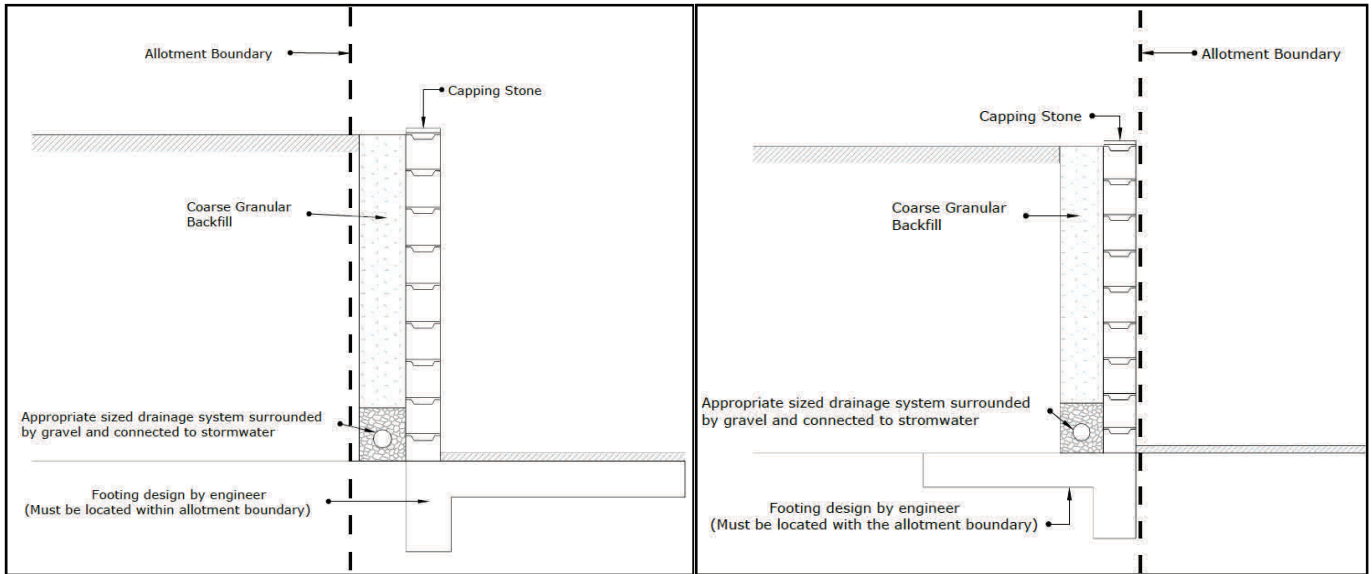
Indicative diagrams showing example location of retaining wall, drainage pipes and backfill in relation to property boundary.
